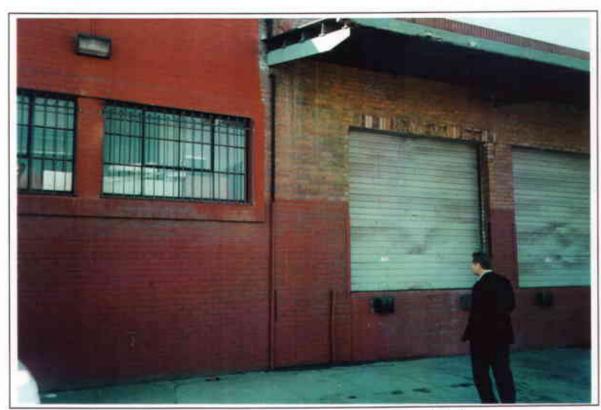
View of vent pipe located on the north side of the warehouse of Thai Kitchen.
